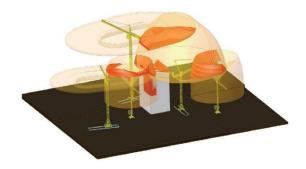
IMAGE: Source: (Ebner; Kammergruber; Horenburg; & Günthner, 2012) 3D MODEL SHOWS POTENTIAL COLLISIONS BETWEEN CRANES AT THE CONSTRUCTION SITE
